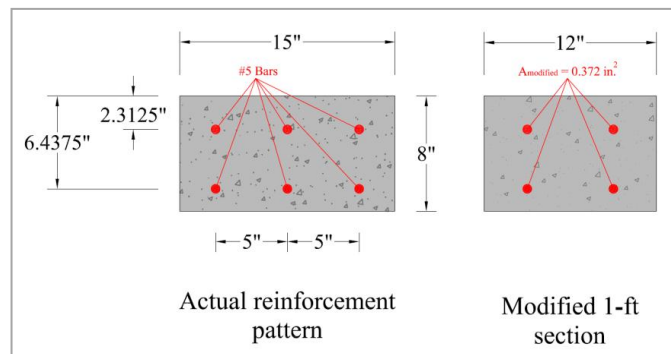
Actual and modified 1-ft wide section of the concrete deck in the transverse direction
